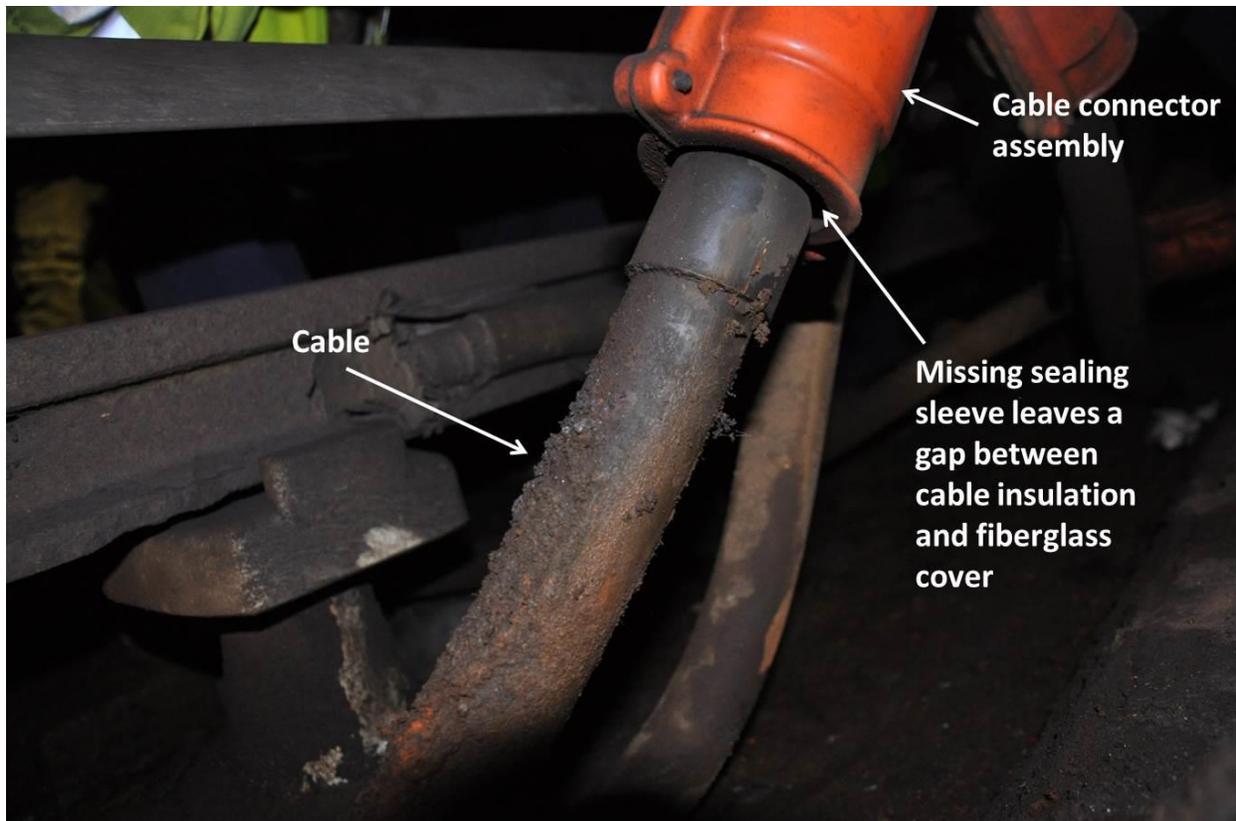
Track 1 cable coated with moist mud-like contaminants, and cable connector assembly without sealing sleeve.
